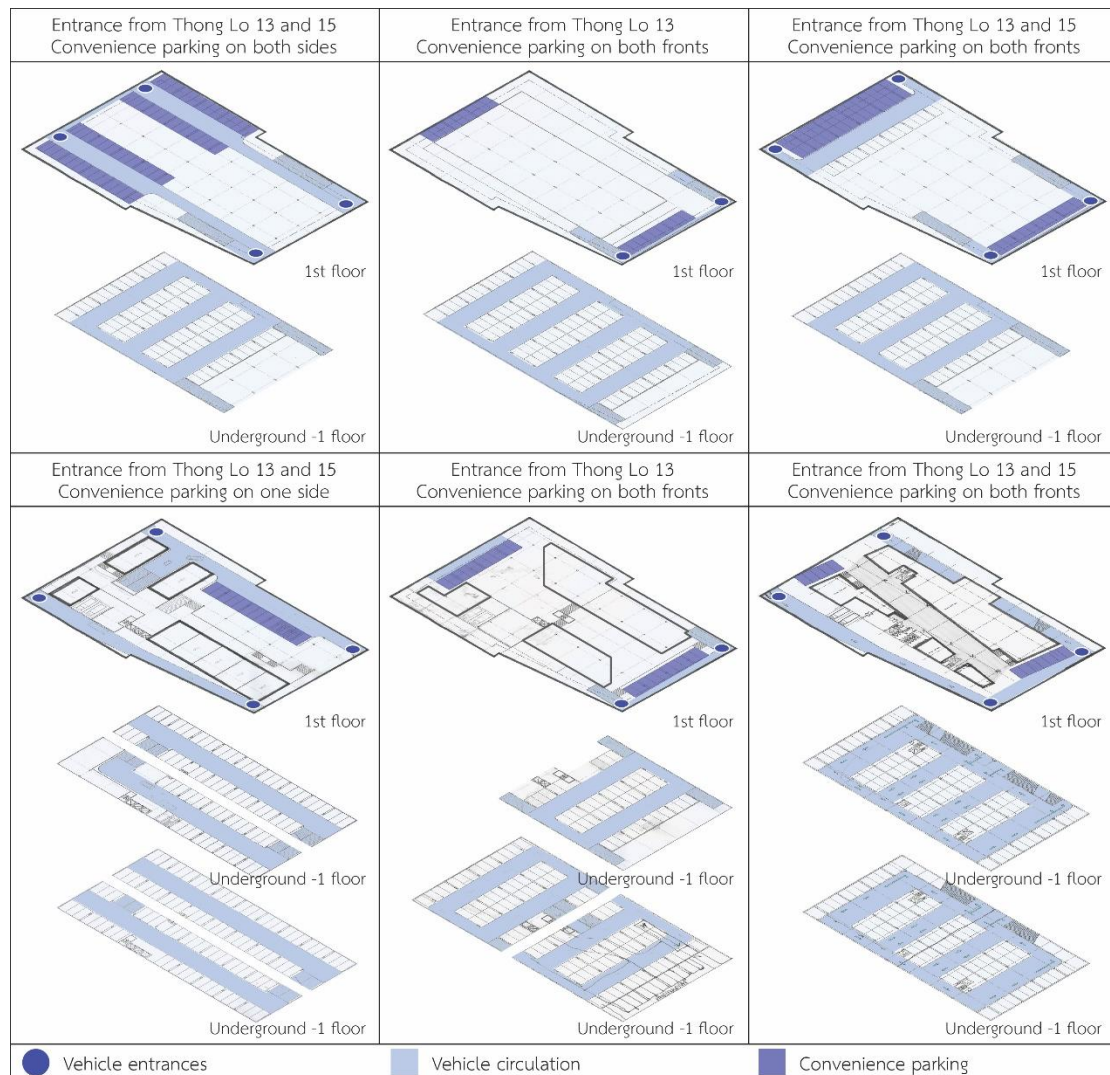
Design schemes of different convenience parking locations and underground parking configurations.
